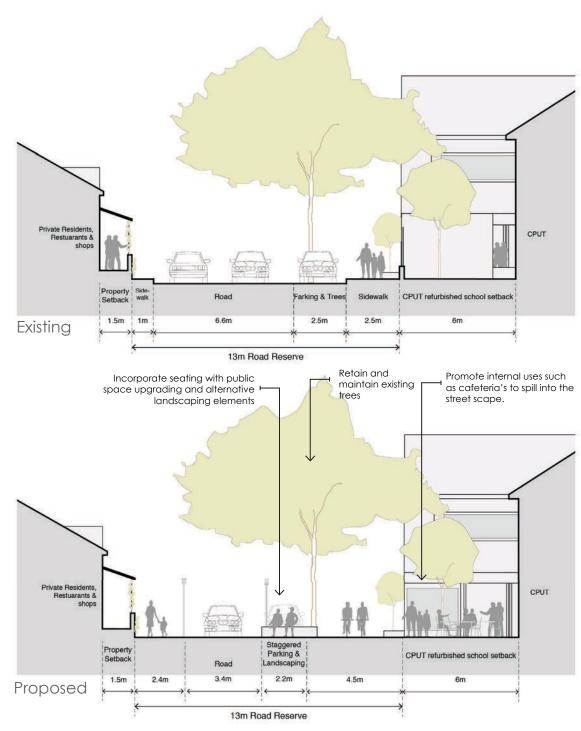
SCHOOL TO PARK | CPUT ON MALHERBE STREET : SECTION DD
